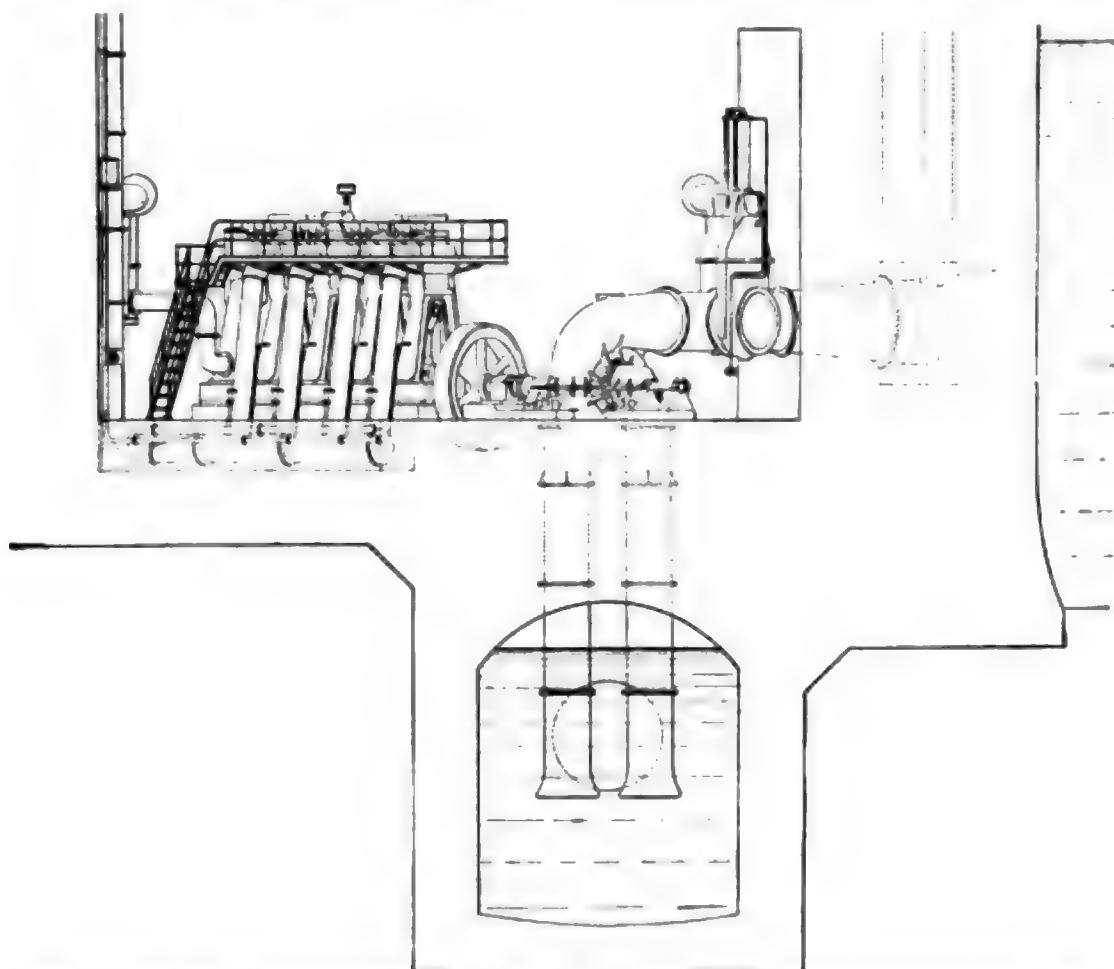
CROSS SECTIONAL ELEVATION OF PUMP ROOM SHOWING WORRINGTON PUMP DRIVEN BY THE DIESEL ENGINE.
